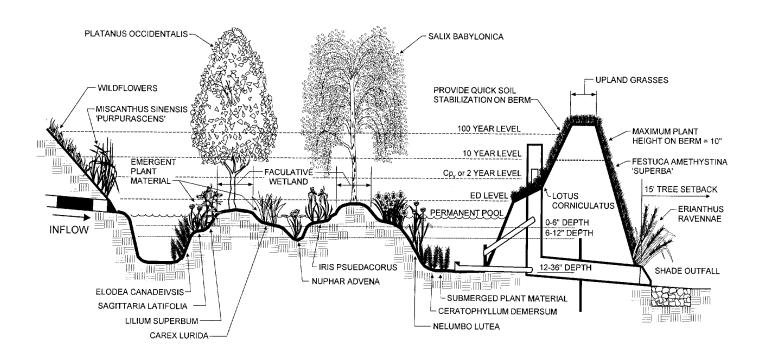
Section of Typical Shallow Extended Detention Marsh System
